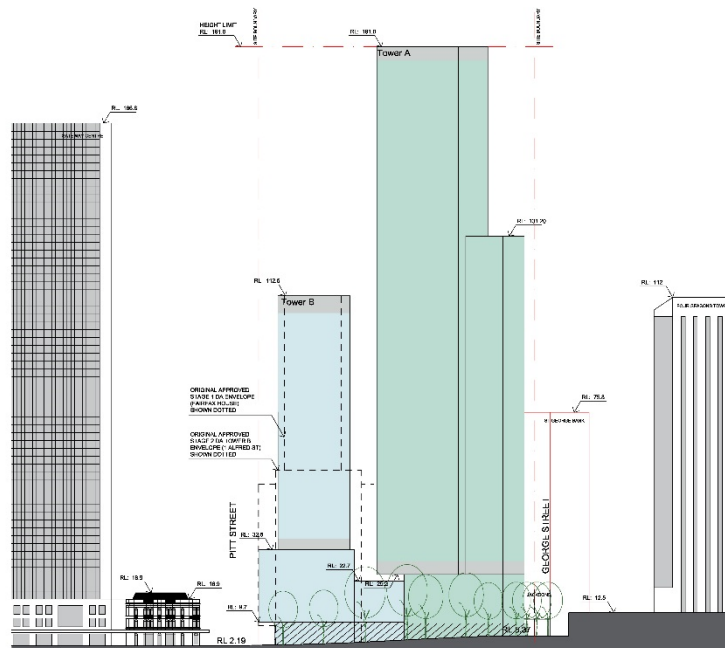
Proposed building envelopes in the concurrent Stage 1 DA
